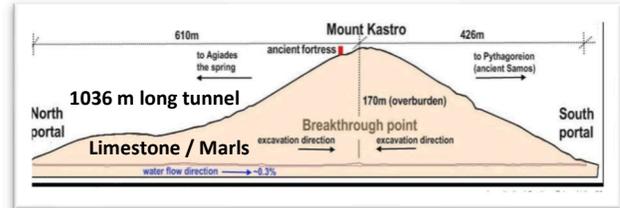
Idealized cross-sectional Tunnel Alignment of Eupalinos Tunnel. Modified after Greek Tunnelling Society, 2022.
